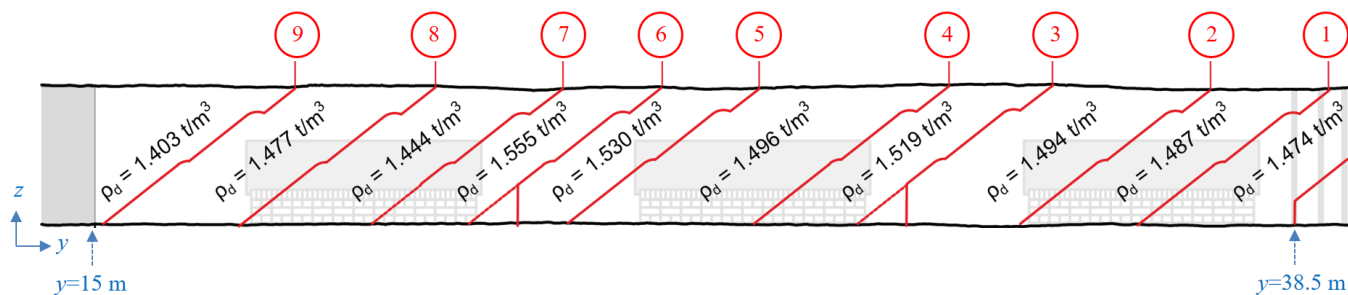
3-D slope scans and bulk dry densities of longitudinal section of the backfilled FE tunnel (adapted from Lanyon et al. 2020).
